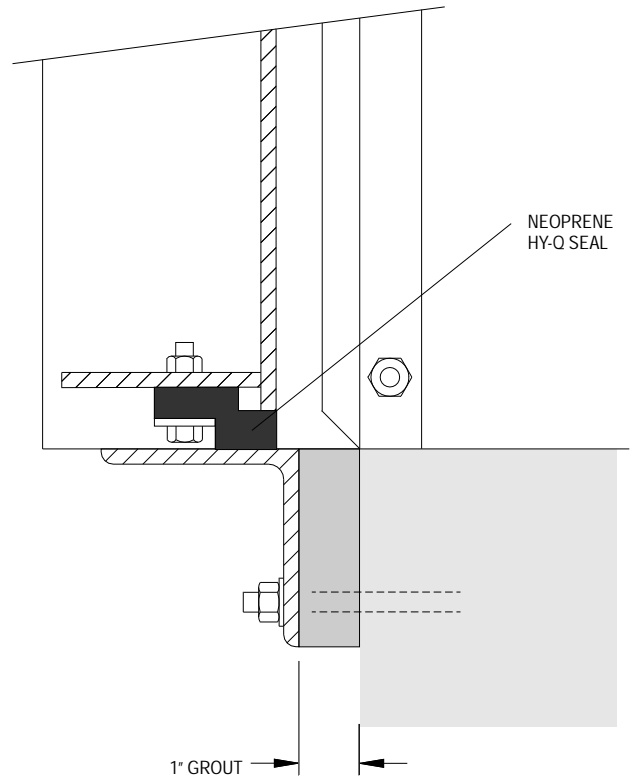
763- Stainless Steel End-of-Channel Mounting with HY-Q Seal; Section BB
